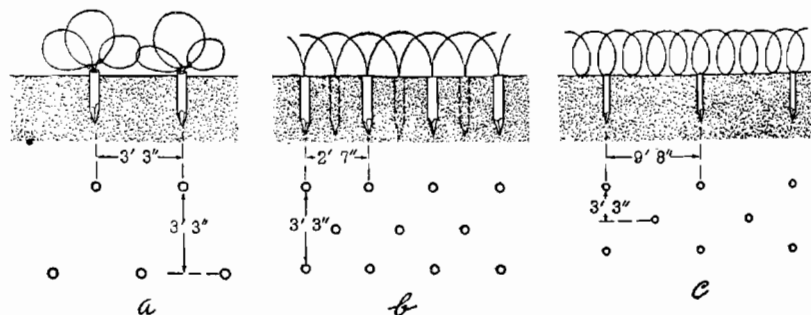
Japanese Wire Snares (a, ring-shape; b, half-moon shape; c, tangled-wire type).
